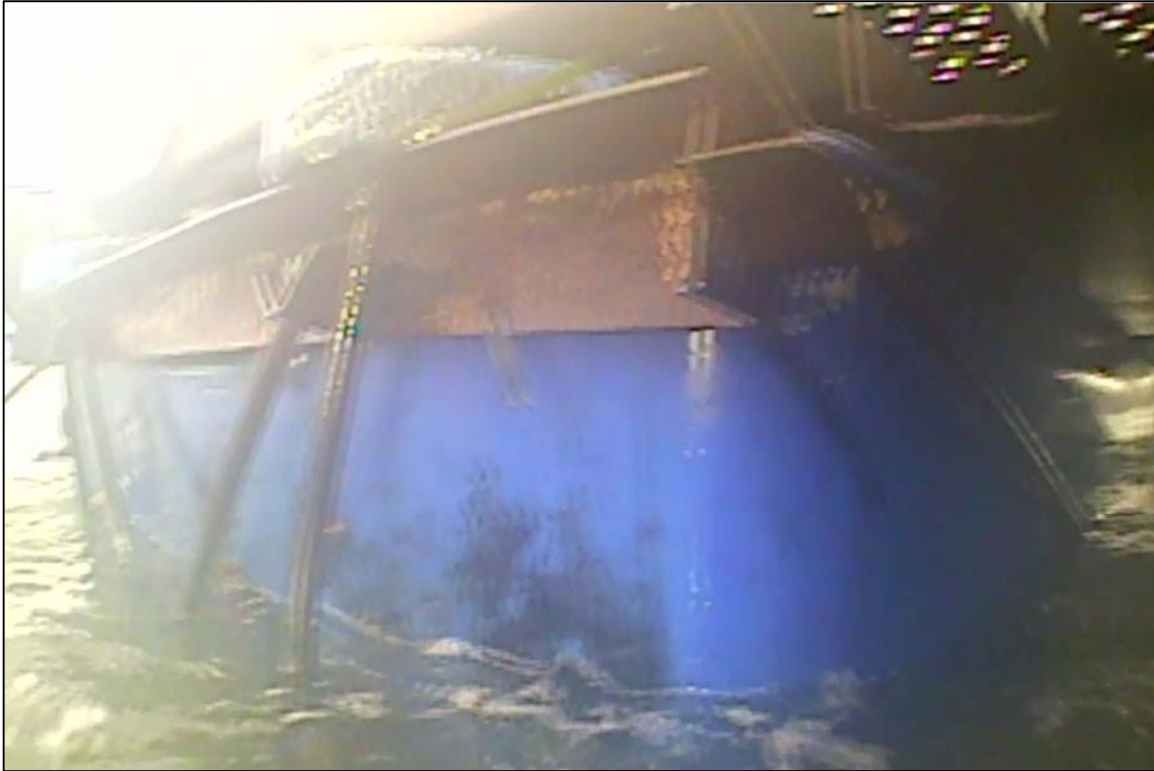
View of the Southeast Corner Pen Support Float and Bracing Below Water, Looking Southeast.
